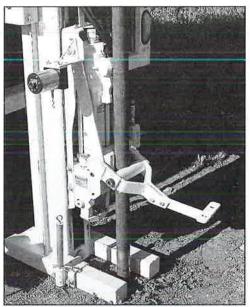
Outer casing may be retrieved with a pull cap or rod grlp pull system if the probe hole is sealed with granular bentonite.
